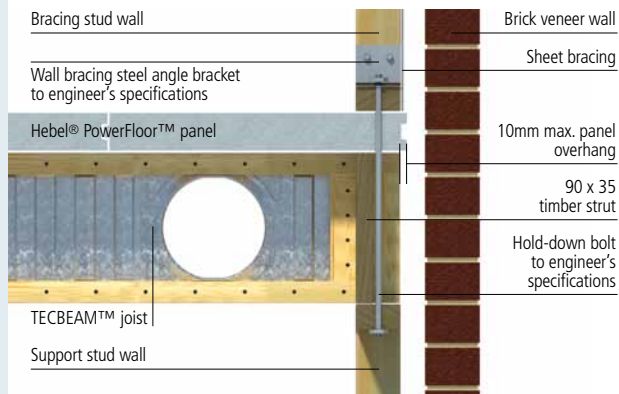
Hold-down of external bracing wall parallel to TECBEAM™ joists
